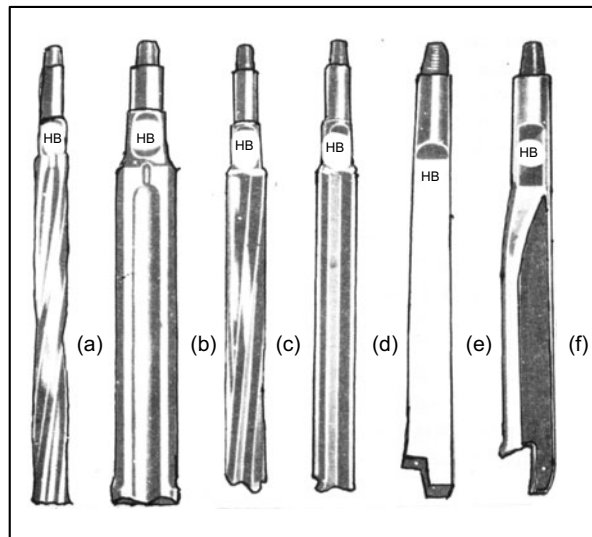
Different types of drill bits used with percussion rigs: (a) Deep-fluted twist drill bit (for hard formations), (b) Flat-fluted drill bit (for soft rock strata), (c) Twist star drill bit (specifically suited when the formation is at an angle), (d) Straight star drill bit (for heavy duty jobs and straightening crooked holes), (e) and (f) Enlarging drill bits. *Courtesy: Hardwood Bagshaw Engg. Ltd.
